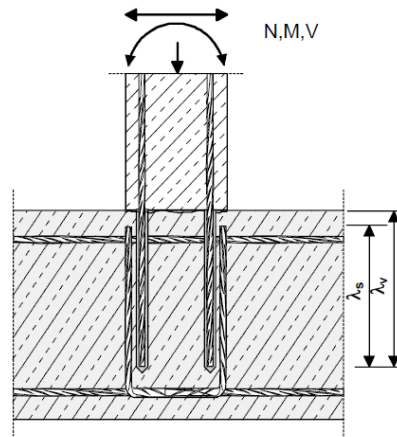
Overlap joint at a foundation of a column or wall where the rebars are stressed in tension
